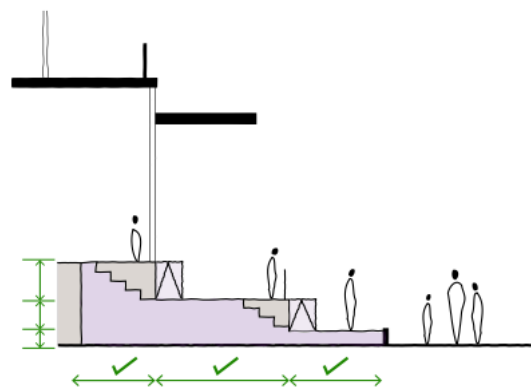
Transition zones can be either internal or external to the building. Sections 4.3 and 4.4 provide guidance on how to design this.
